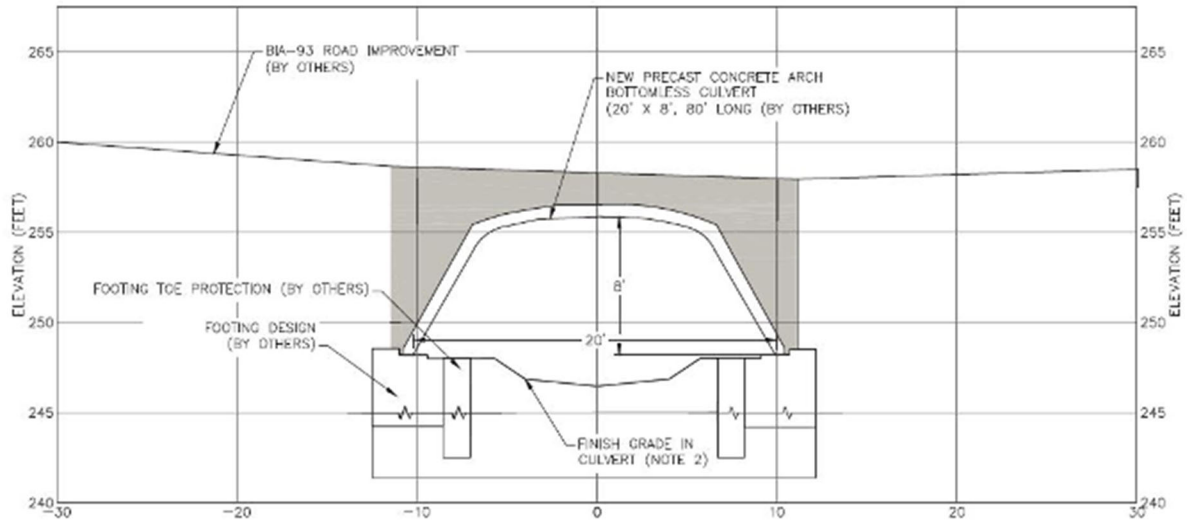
Design detail of the arched natural bottom culvert planned for installation under Rancheria Road.
